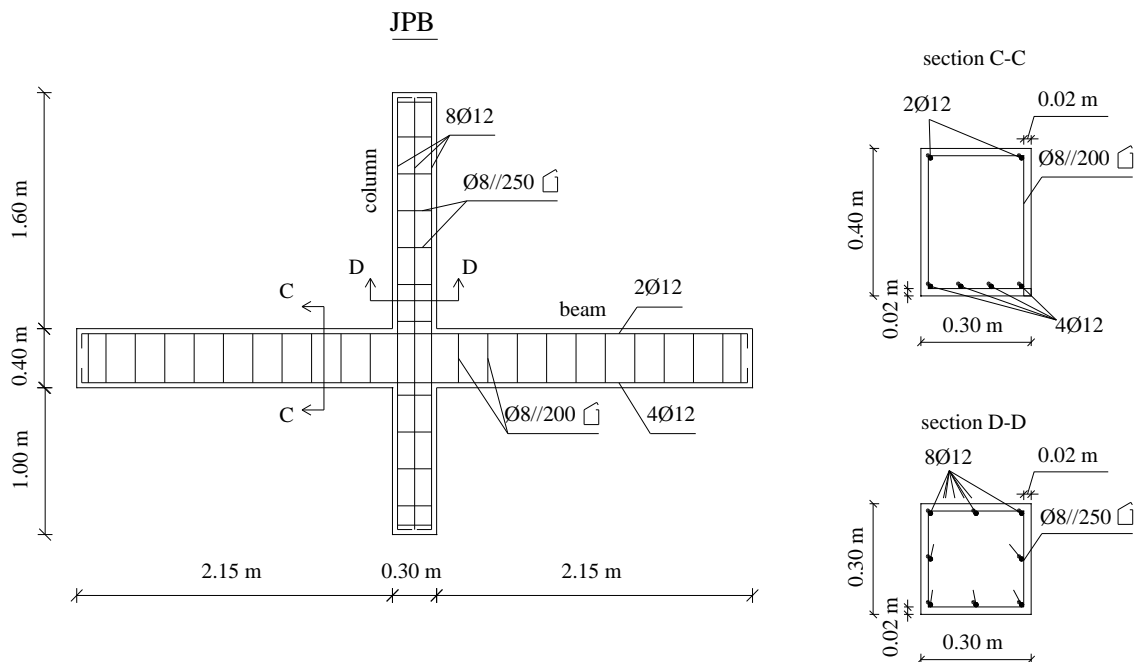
Dimensions and reinforcement detailing of specimen JPB.
